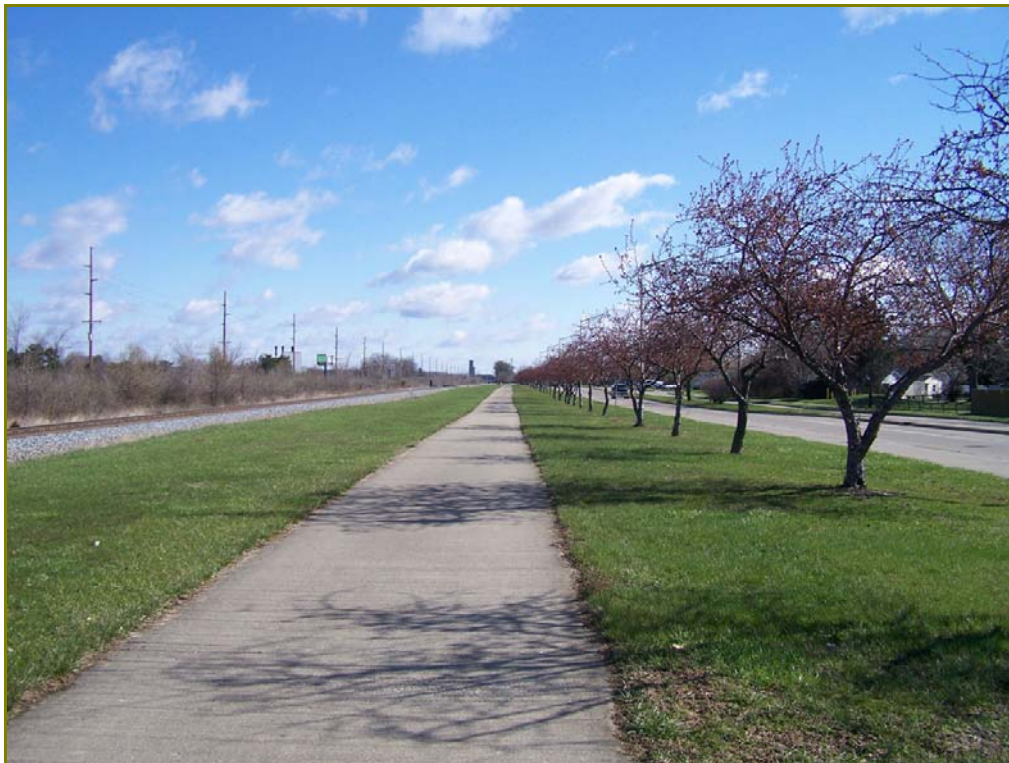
Area A: intersection of Kauffman Avenue and Vine Street, looking northeast
